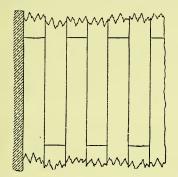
Floor with Joints Broken at 3-ft. Intervals.
